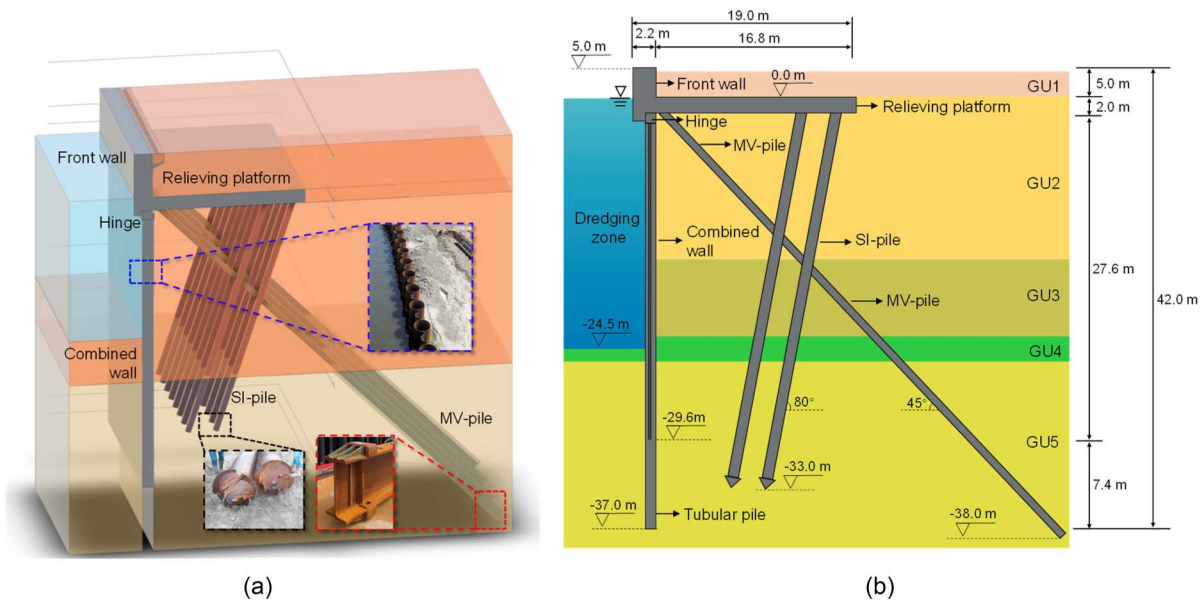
(a) Structural elements of the quay wall in 3D view; and (b) geometric configuration of the quay wall.
